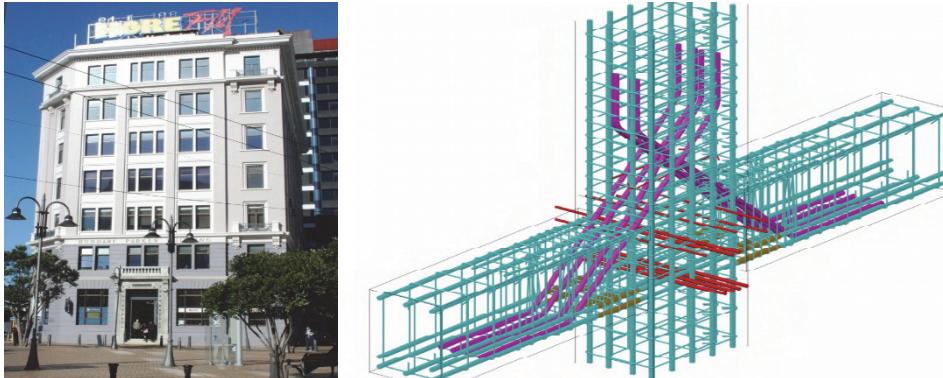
Exterior view of Huddart Parker, and slotted beam reinforcement arrangement.
